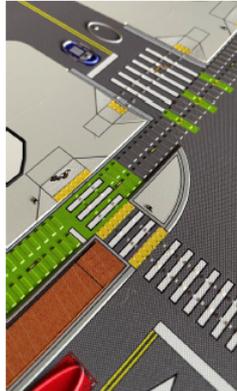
Tactile graphic developed for this project showing a preliminary concept for the intersection of Fenton Street and Ellsworth Drive in downtown Silver Spring.
